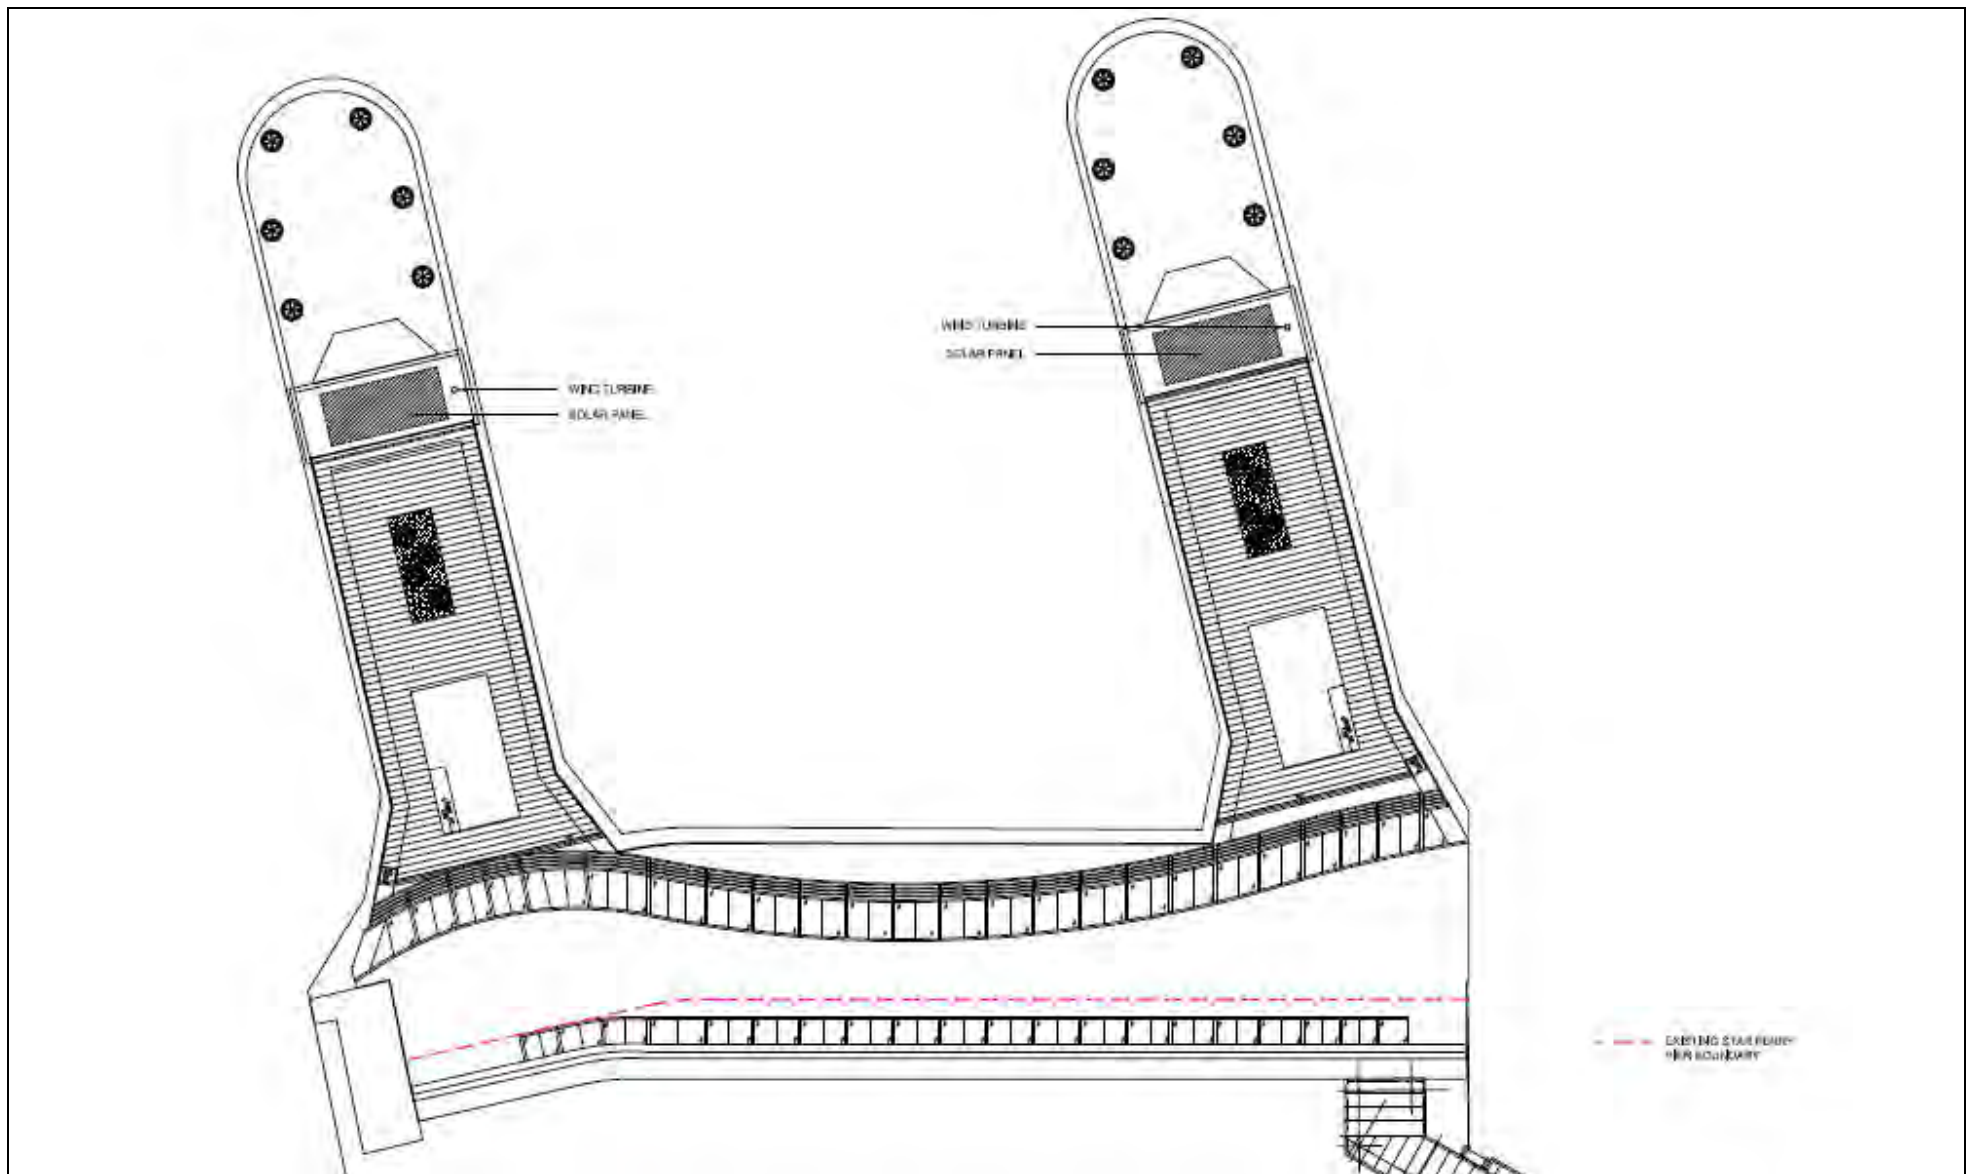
Proposed Rooftop Layout Plan – Machine Room.
